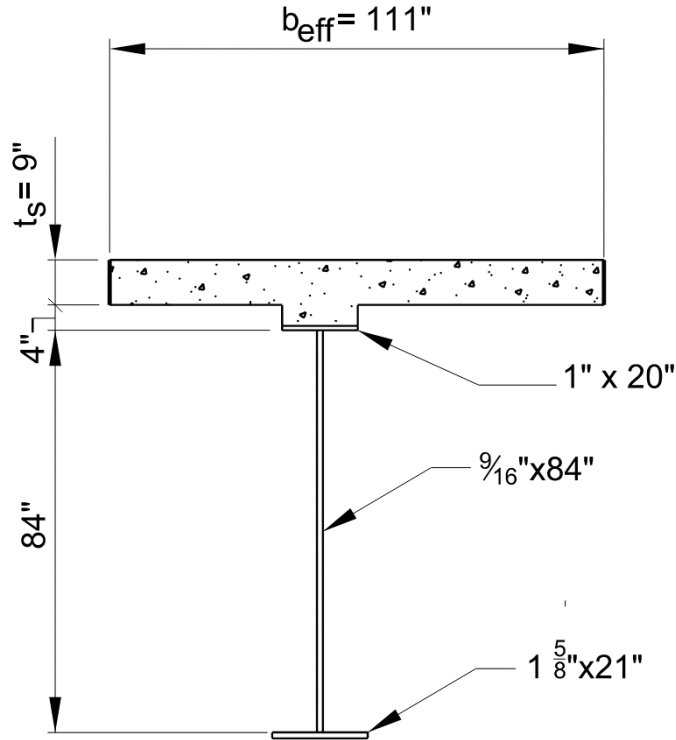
Sketch of I-girder Cross-Section at Section G4-1
